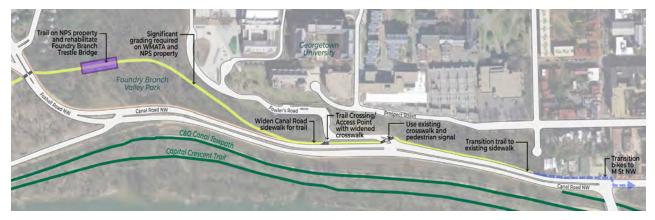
Option 1 - Foundry Branch Trolley Trestle Bridge to Canal Road
